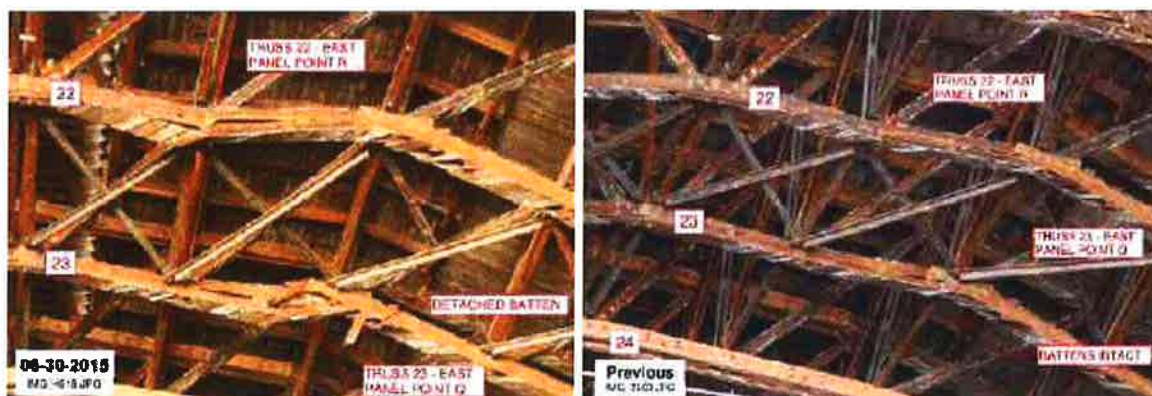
Truss damage progress at Trusses 22 and 23 East near Panel Points R and Q.
